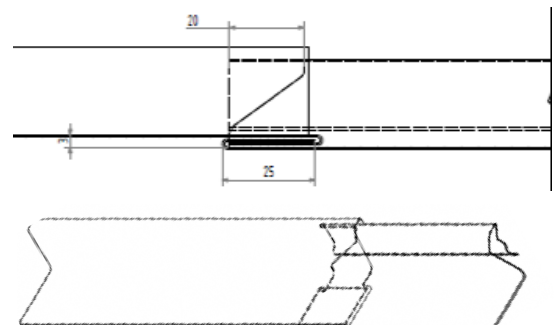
CROSS-SECTIONS OF THE PANEL CUT-OUTS THAT SEAL THE SHORT JOINTS
